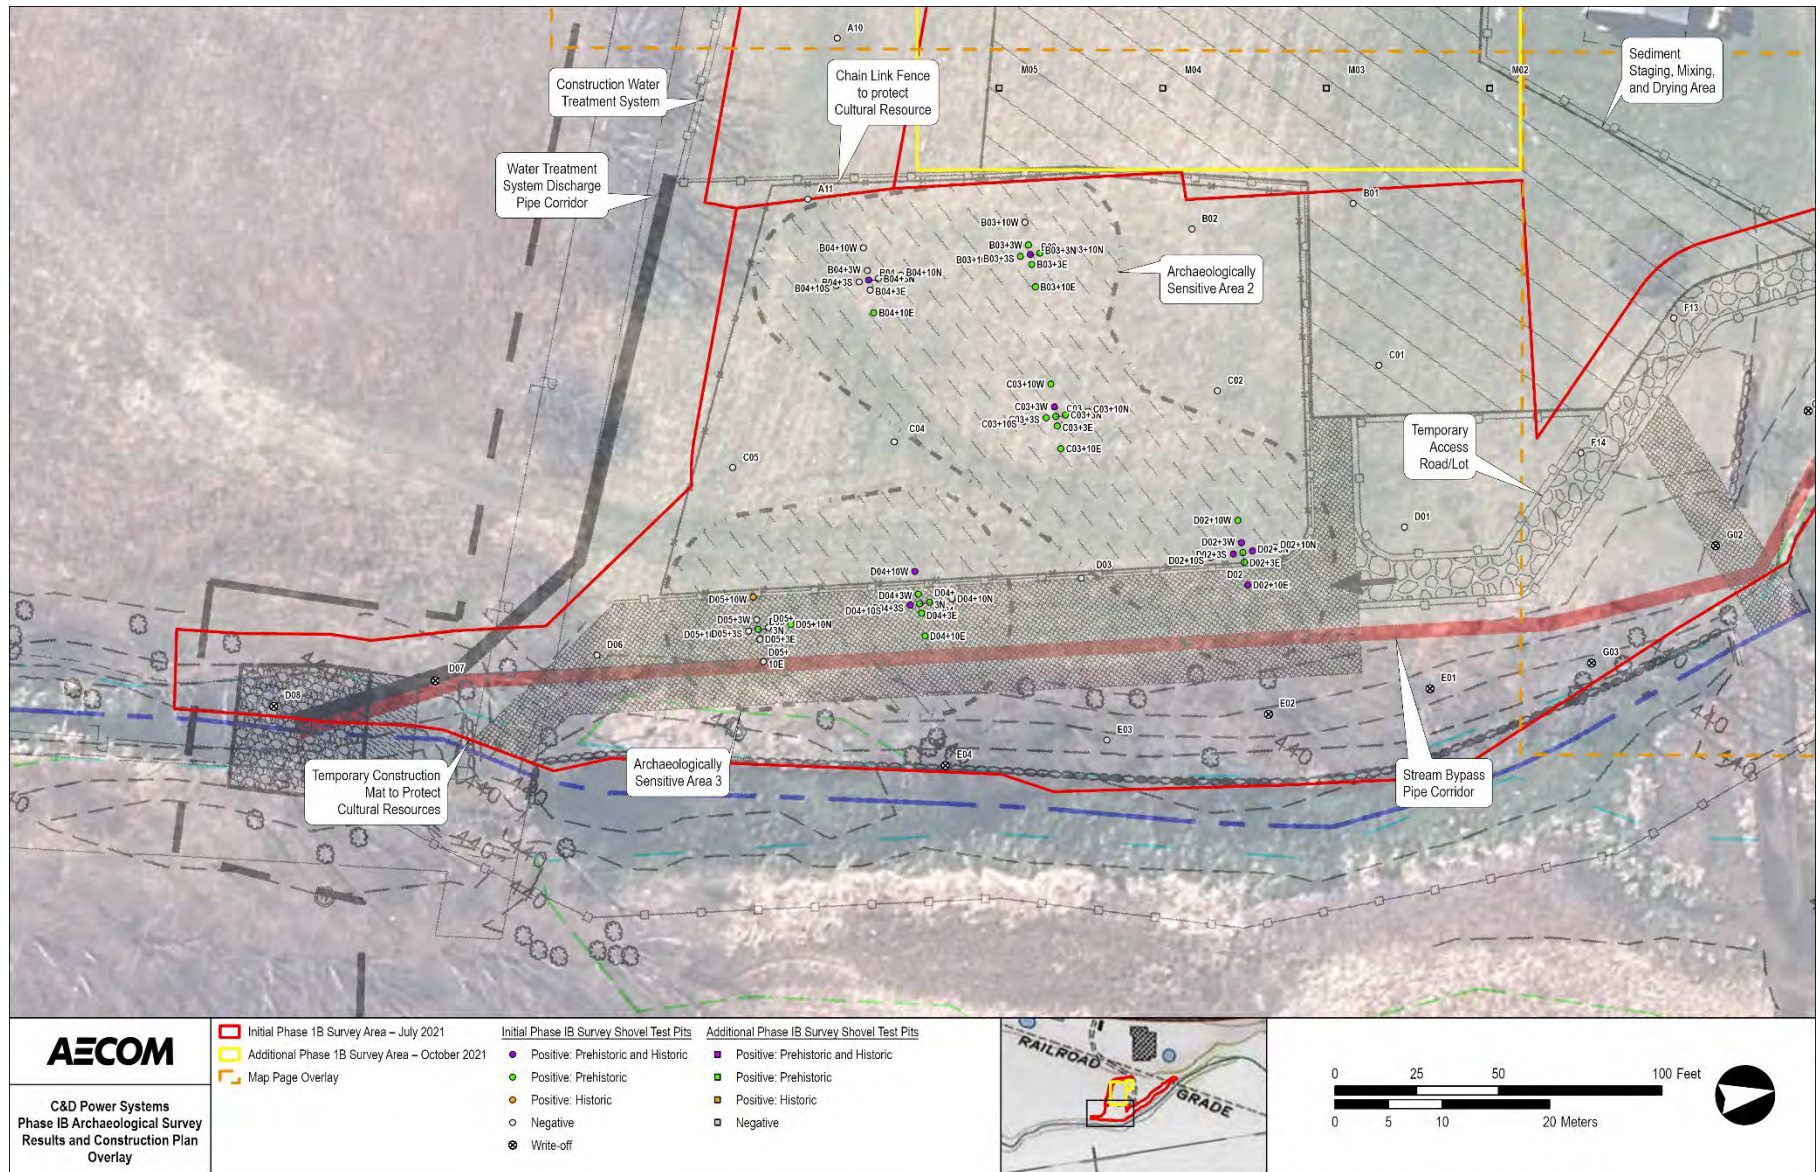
Phase IB Survey Results and Construction Plan Southeast
